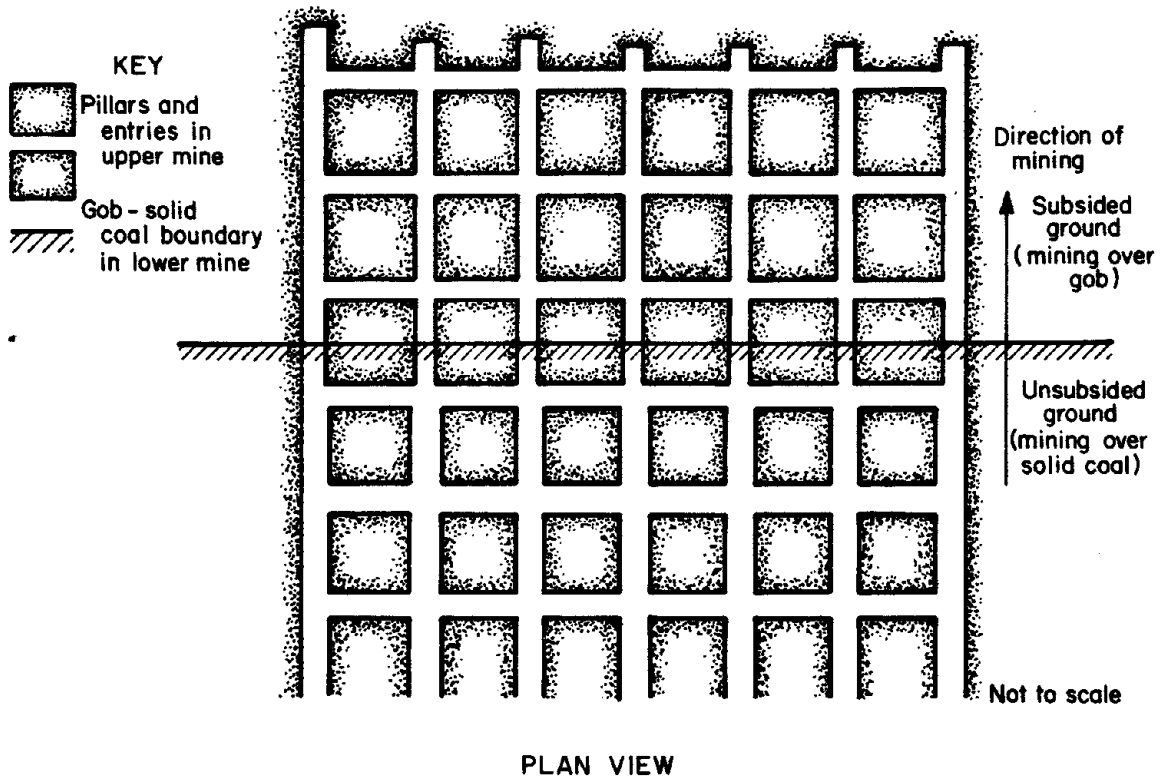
Reducing entry width in upper mine when developing over subsided ground.
